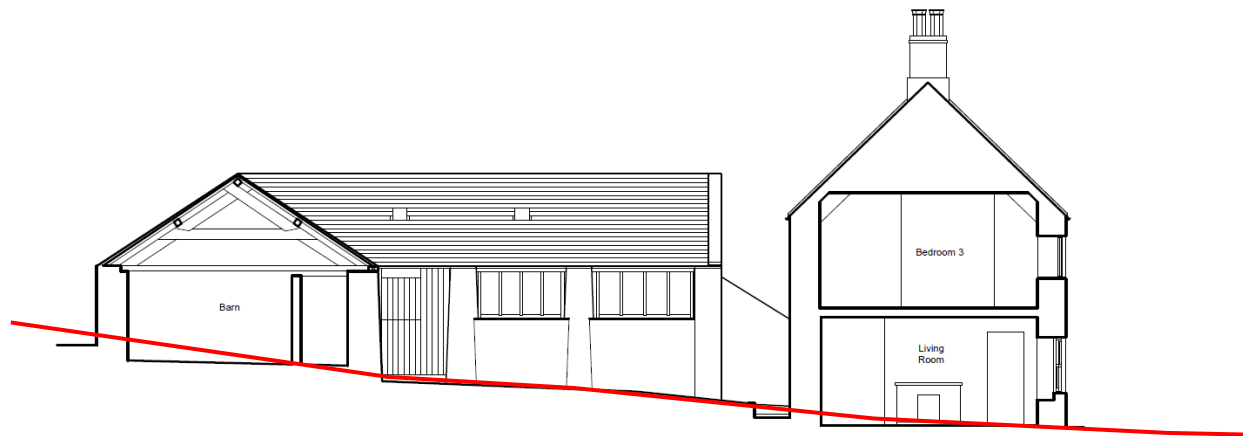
A north-south section through the PDA (A-B on figure 6) showing the general north-south slope of the site (highlighted in red) into which, to greater or lesser extent all the building ranges have been terraced. From Doonan Architects Drawing No.1088 E1.
